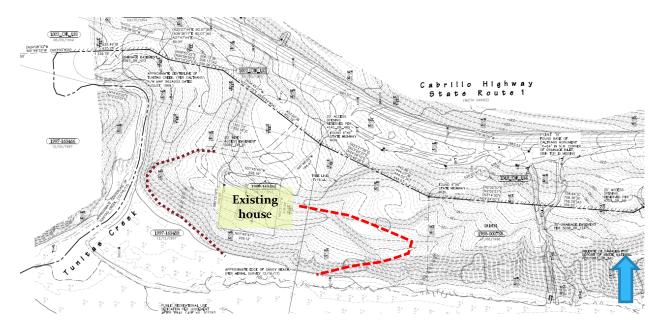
Existing/ proposed and alternative roadways to Tunitas Creek Beach
